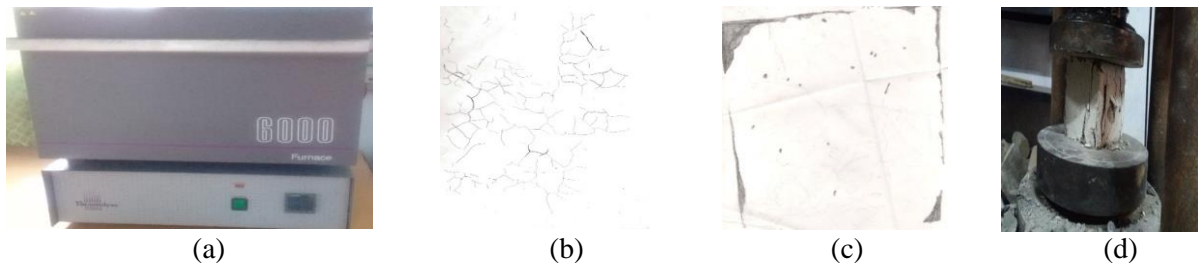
(a) Electric furnace for sample heating, (b) 800°C- 4 hours cracking, (c) 600°C -2 hours spalling and (d) Compressive strength testing set up of concrete block
